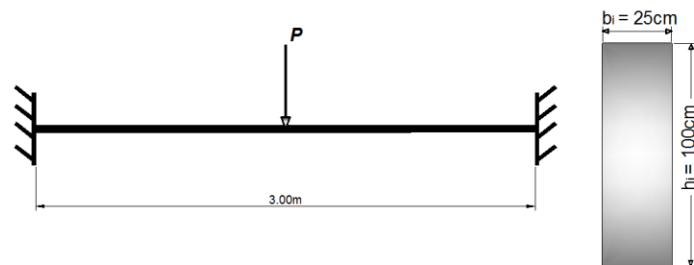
CLAMPED BEAM. GEOMETRIC AND SECTION DETAILS.
